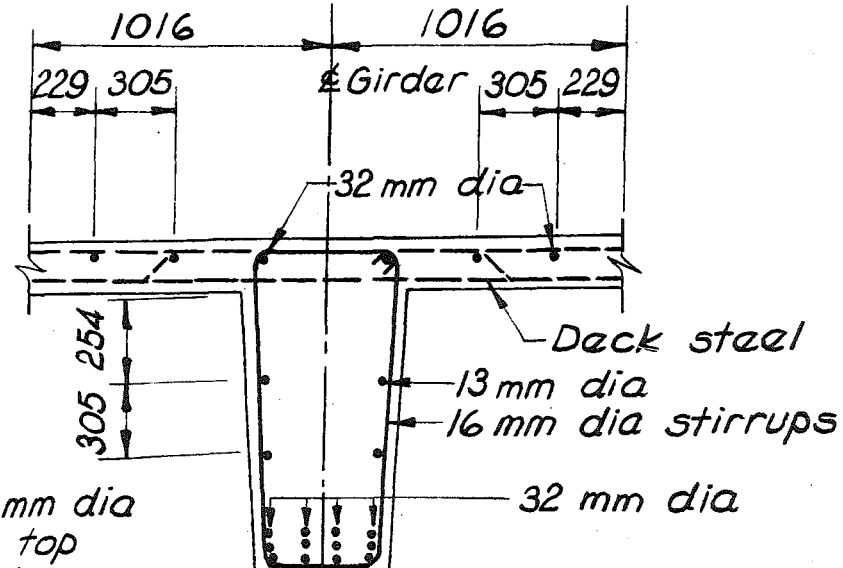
STRUCTURAL DIMENSIONS OF CURLETT'S ROAD-RAIL OVERBRIDGE
